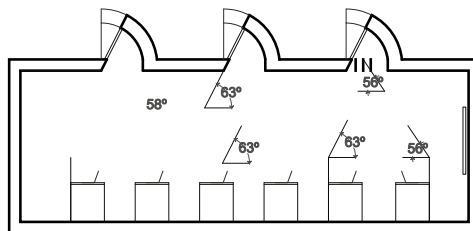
Roof-lights with 'view-shaded' windows.
